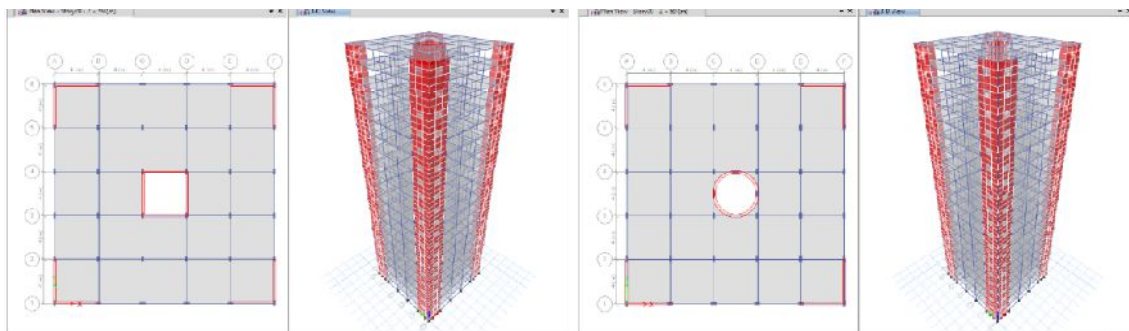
Model 3 (building with square Core wall and shear wall at each corner of Exterior frames)
